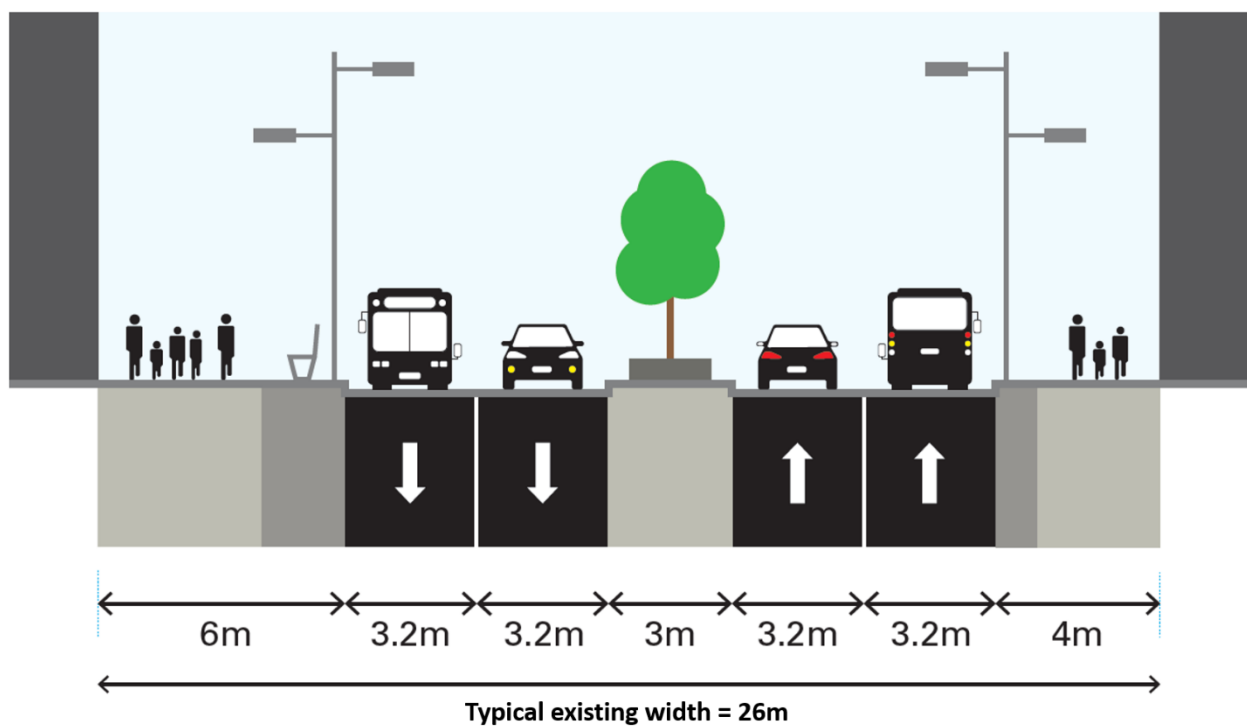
Typical Cross Section from Gerrard Street to College/Carlton Street
